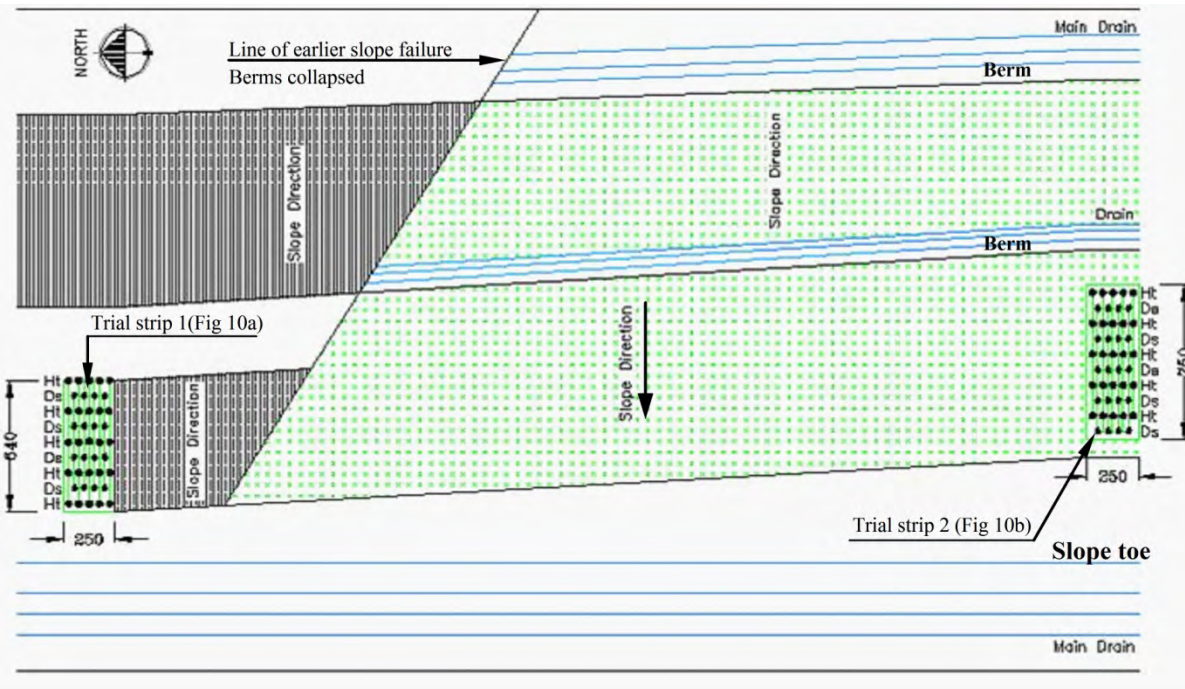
Live pole installation layout plan at the 1<sup>st</sup> trial site
